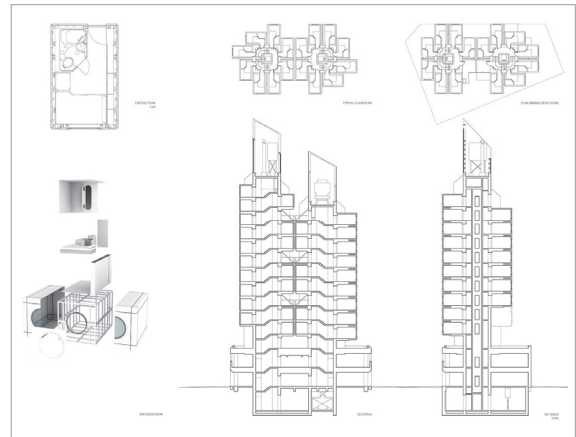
Plan view & elevation drawings of Nakagin Capsule Tower
